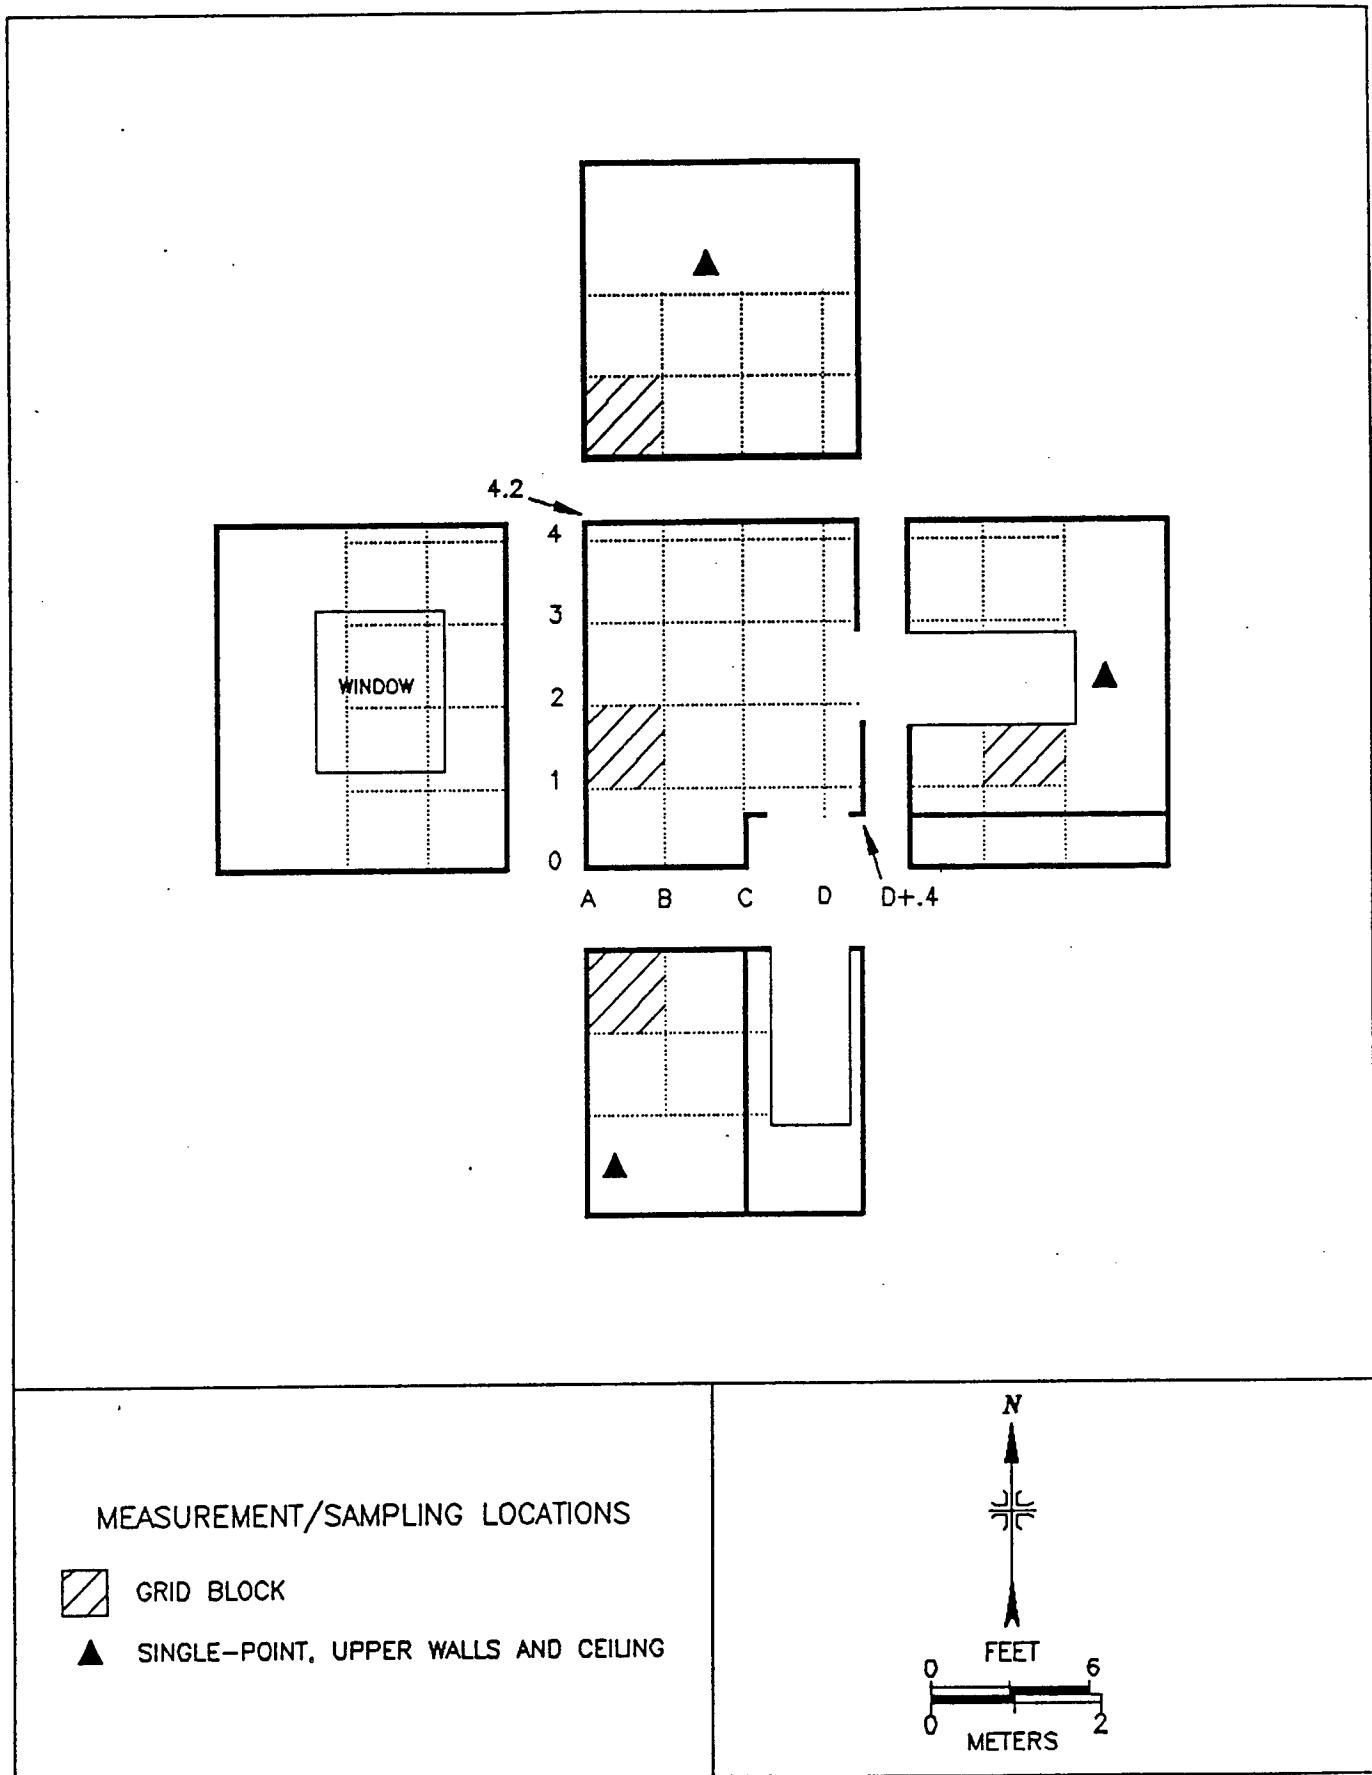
Building 401A, Room 5 — Measurement and Sampling Locations
